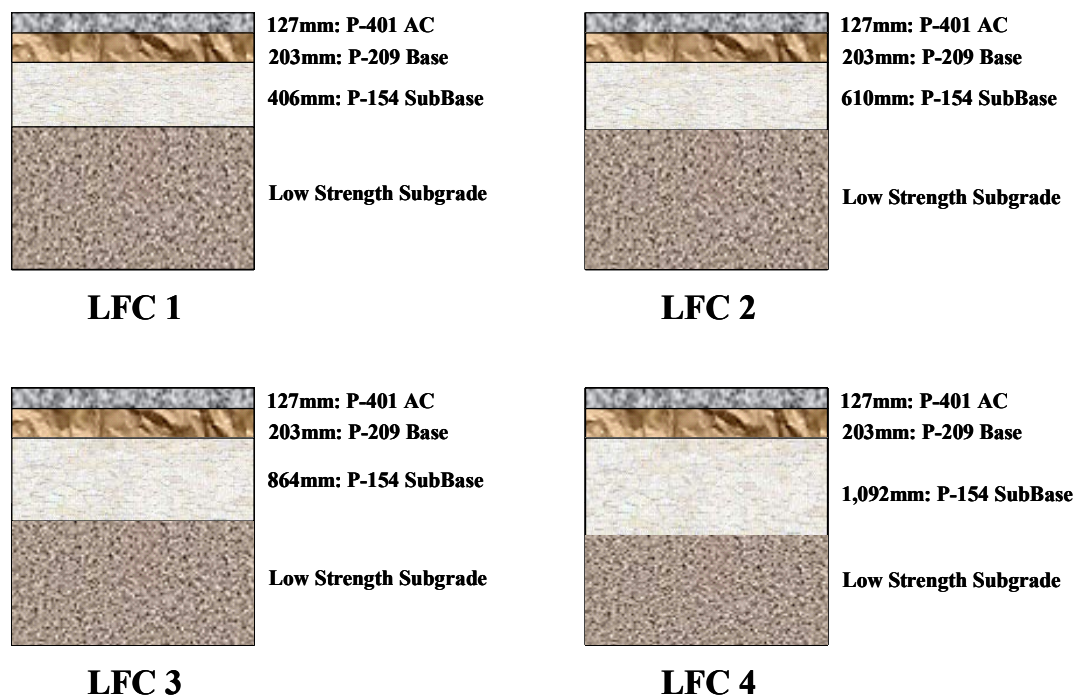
Cross Sections of NAPTF CC3 Pavement Test Sections (Garg, 2003)
